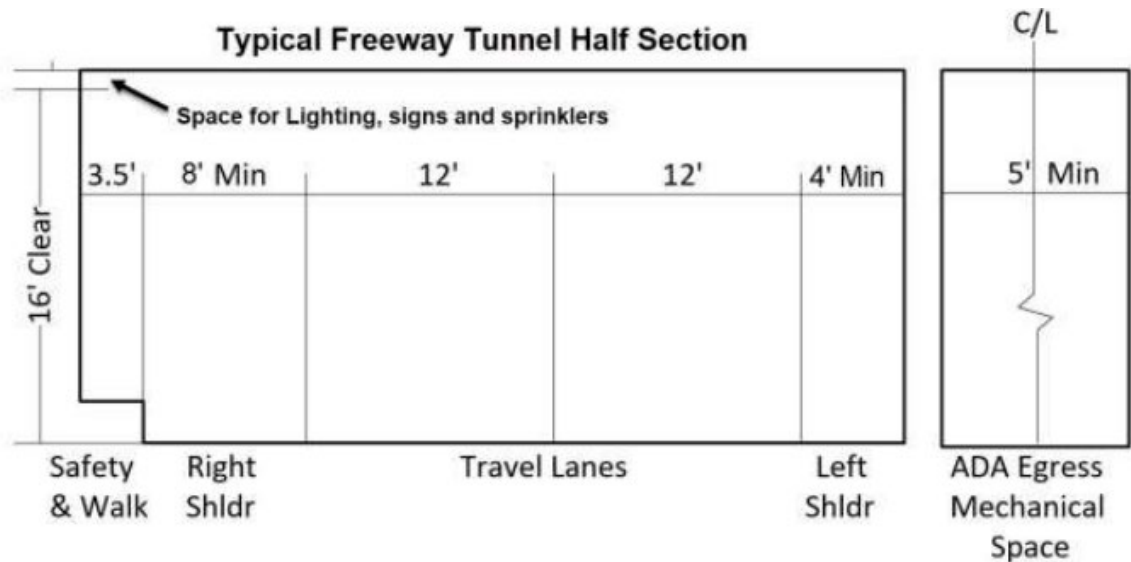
NYSDOT Highway Design Manual Typical Tunnel Section
